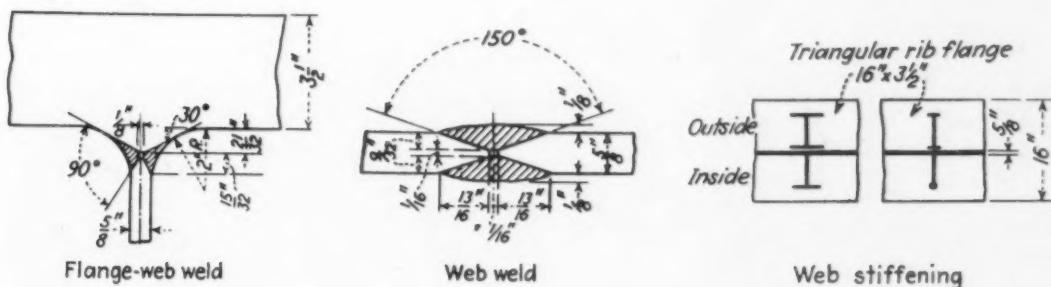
Details of a 108-ft. span all-welded railroad bridge at Stettin.
